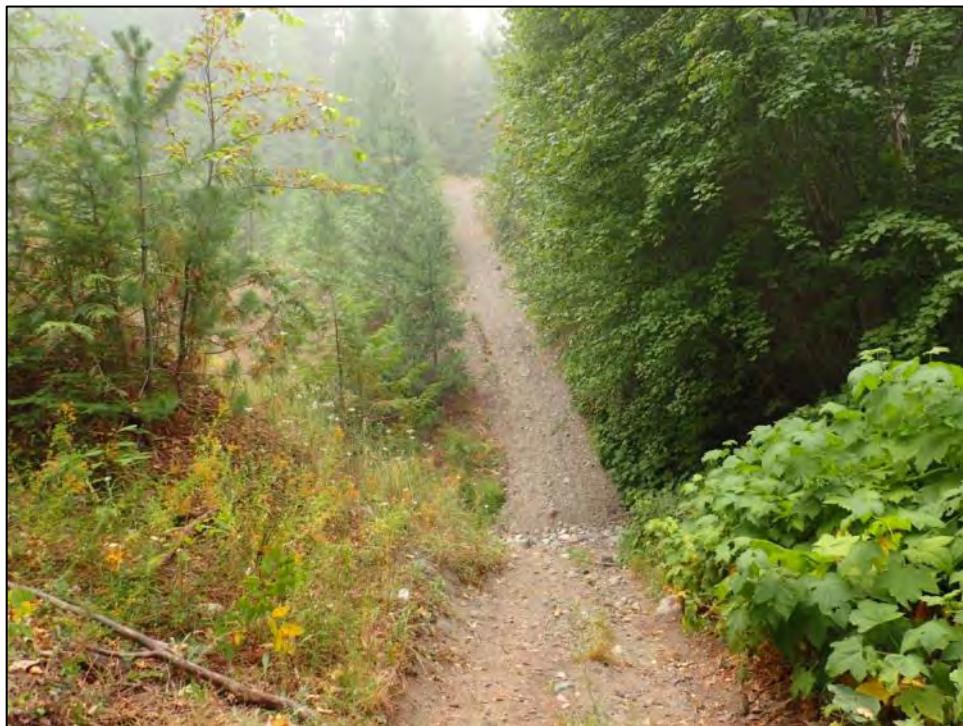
Steep section of rail trail near the gravel pit which a geotechnical review recommended is re-aligned and culverted.
